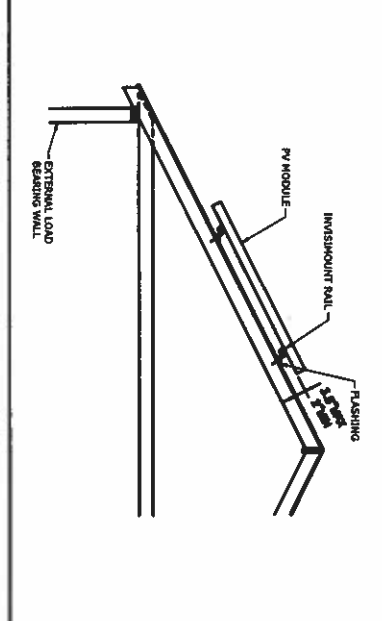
INVISMOUNT ROOF ATTACHMENT DETAILS @ TRUSS / RAFTERS
